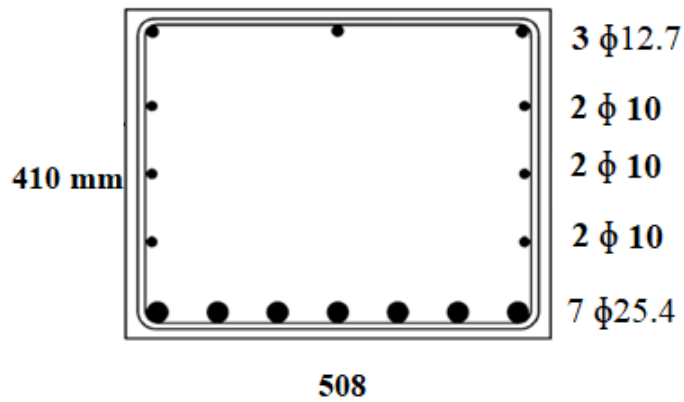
Onsongo beams cross-section (TBS2 and TBS4)
